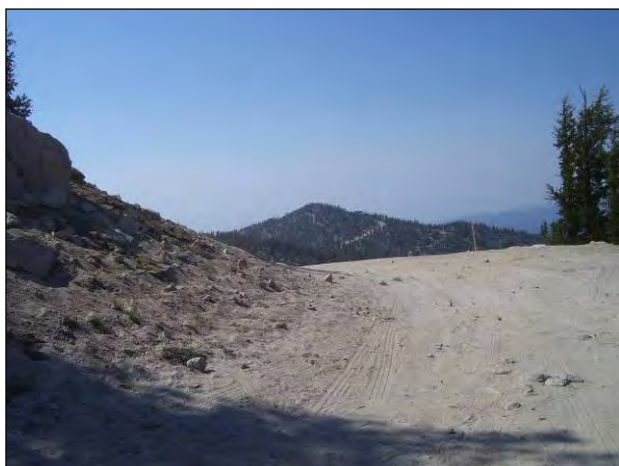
Skyline Trail cut slope and road shoulder, pre-treatment, 2008 (photo point B).
